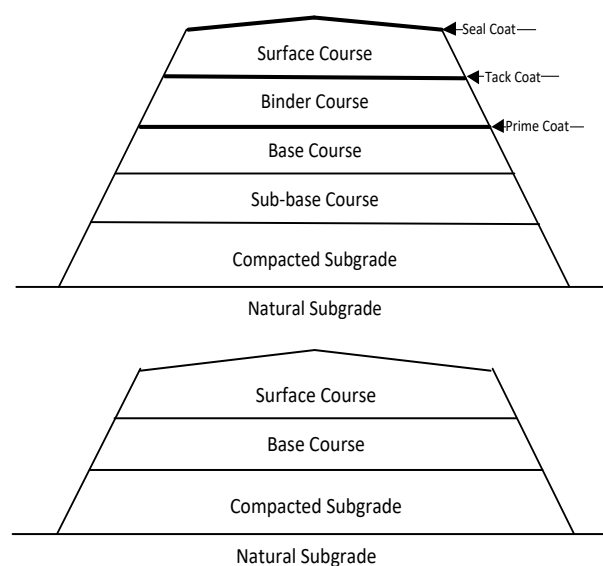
Typical Cross-section for Flexible and Rigid Pavement
